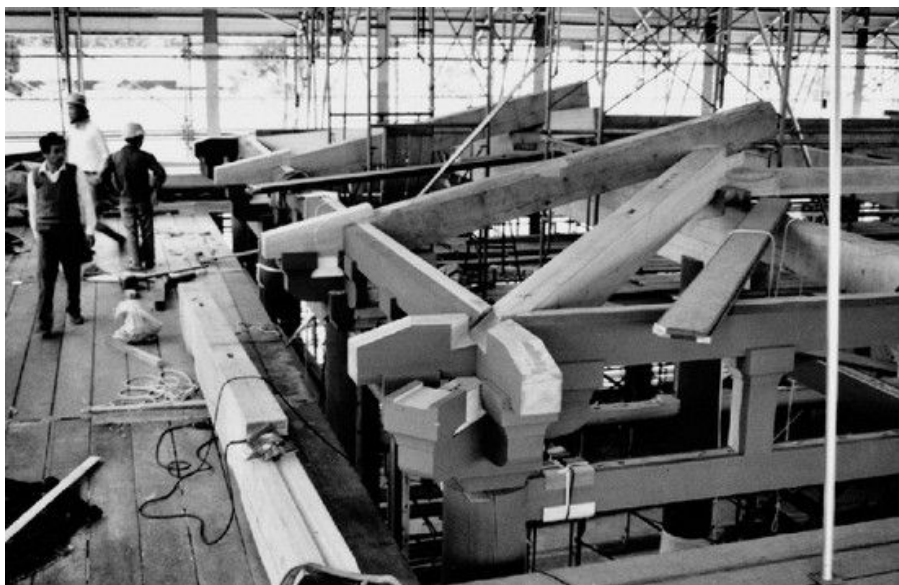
The corner main beams span at a slope from the nearest main beam to the corner bracket complex. The gable end main beams rest directly on the corner main beams and span to the exterior wall.
